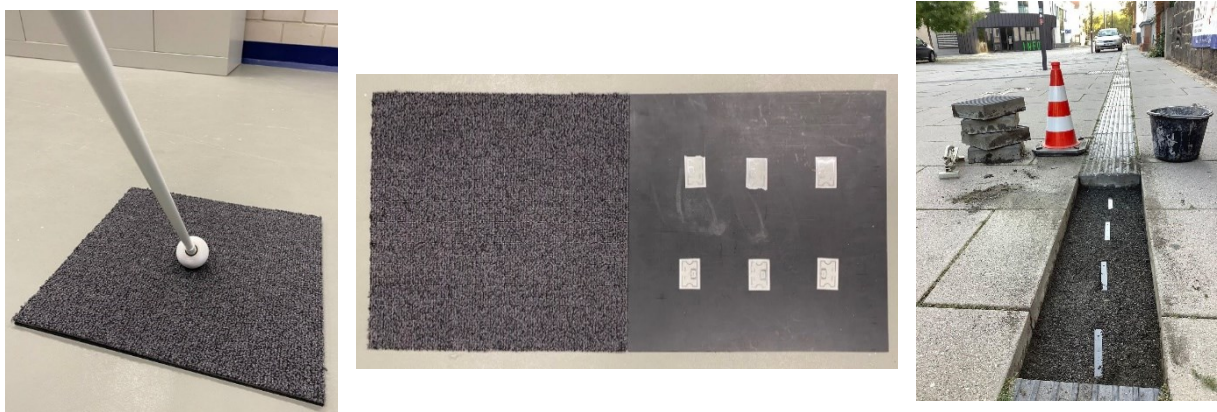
Installation RFID tags under modular carpet (left) and concrete slabs (right) for the development of an electronic blind navigation system (Source: A. Juraboev)
